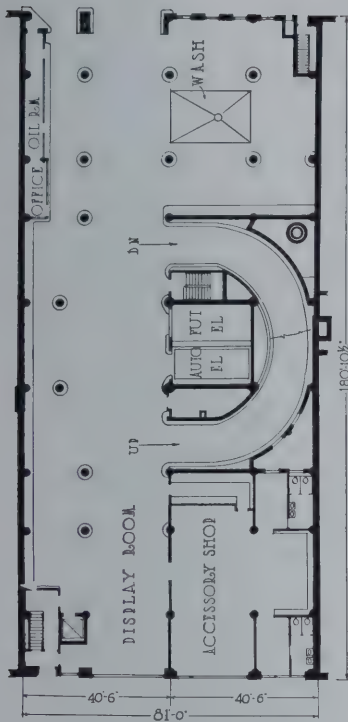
First Floor Plan, LaSalle Garage, Chicago
